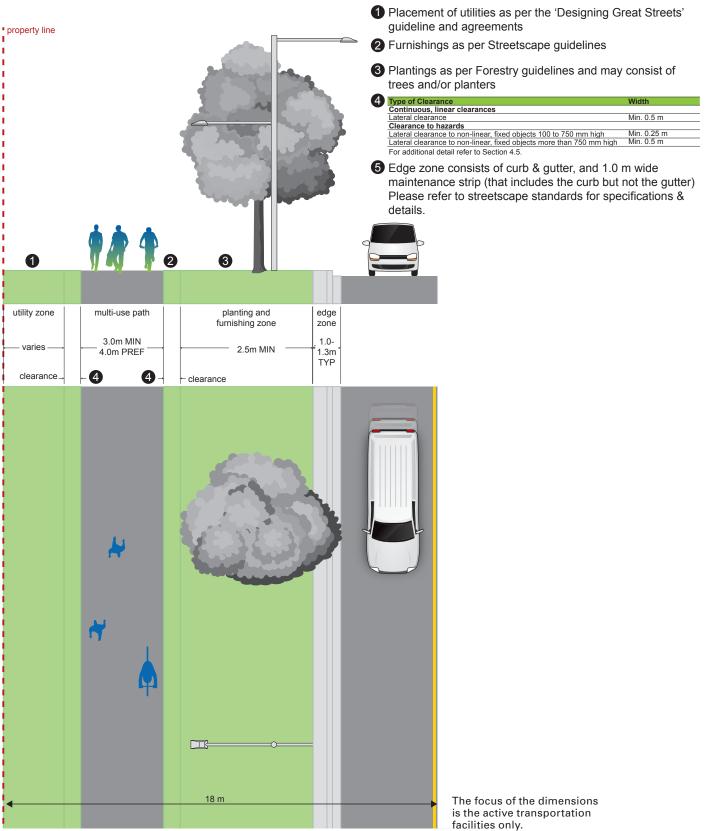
Rural Hamlet Road (36 m ROW) - Multi-use path with two travel lanes and on-street parking
